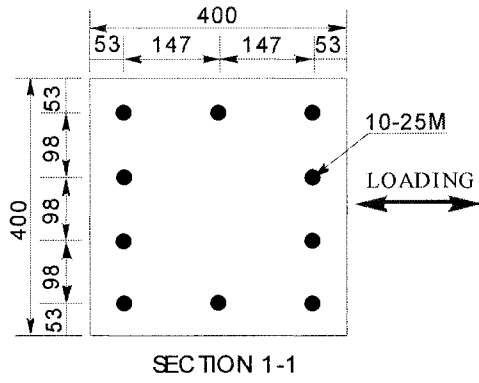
Specimen internal reinforcement details (specimen CV1) (plan)
